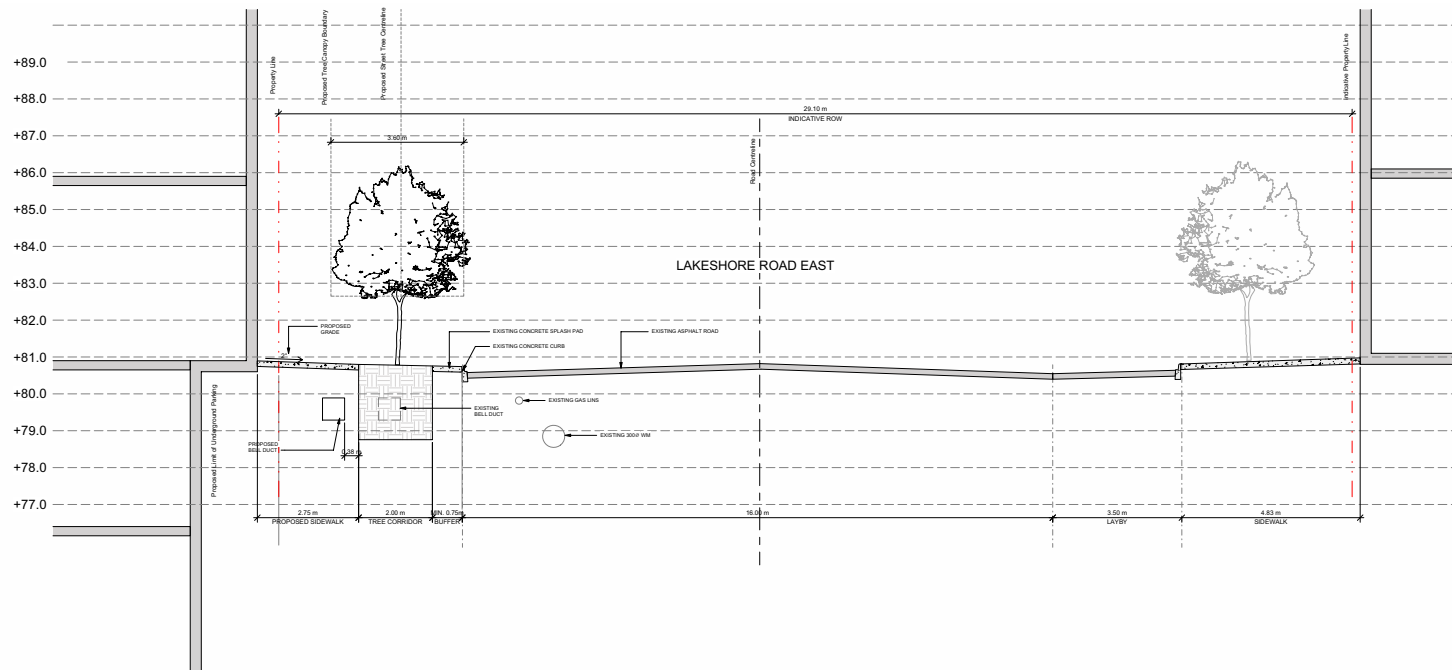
Proposed Lakeshore Road East street section (please see Appendix 1 for 1:50 sections)
